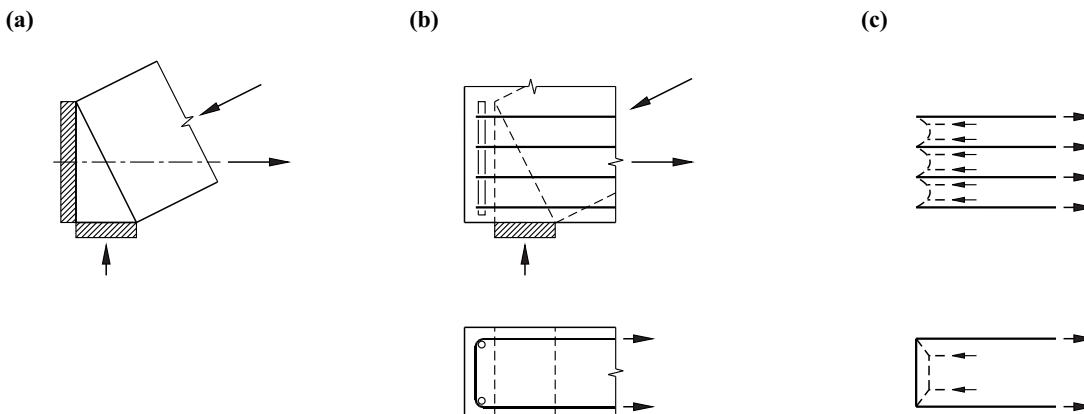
Support joint: (a) longitudinal reinforcement with end plate, (b) U-bars and dowel bars, (c) truss model, elevation (top) and plan (bottom)
